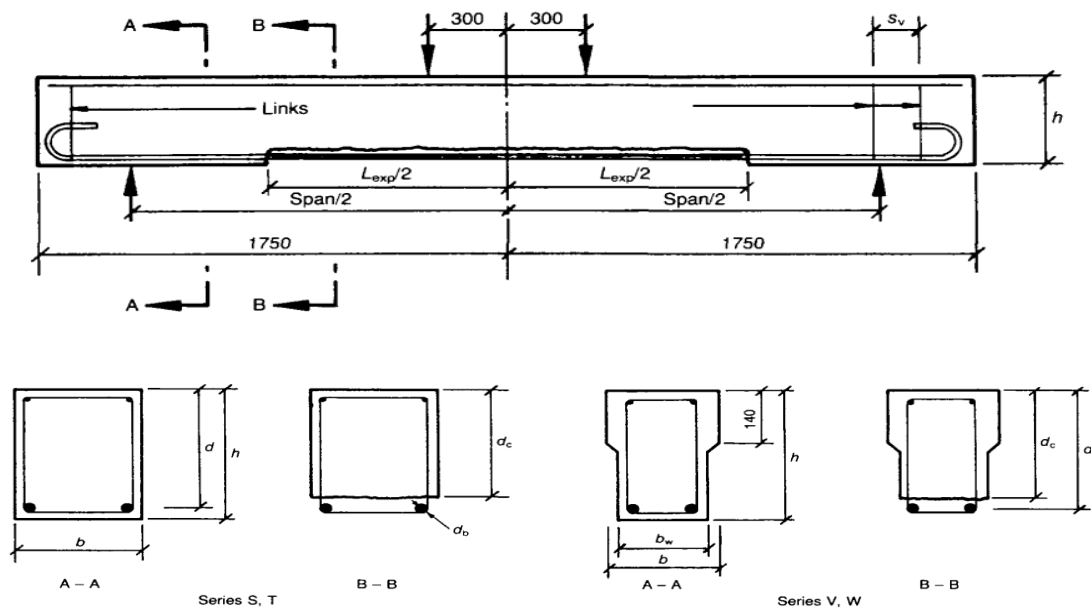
Details of test specimen (Cairns & Zhao, 1994)
